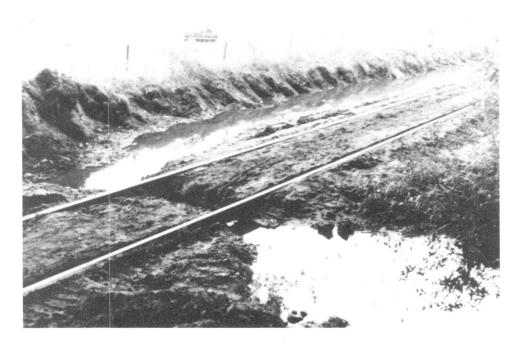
Railroad tracks beneath Fields Landing overpass.
